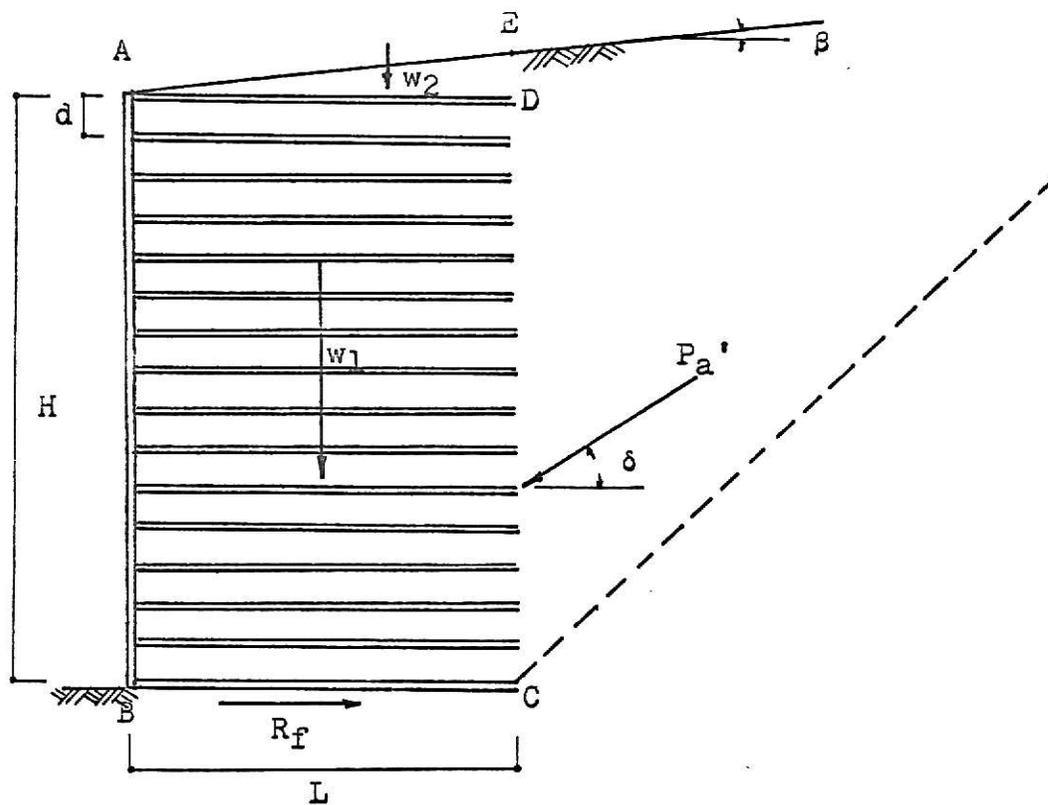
Forces acting on a strap reinforced earth retaining wall
